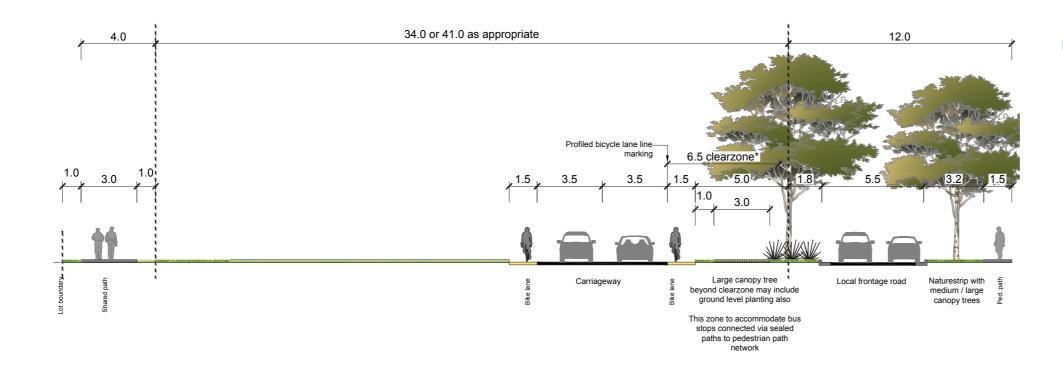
Arterial Road - Initial Road Construction 34m or 41m
